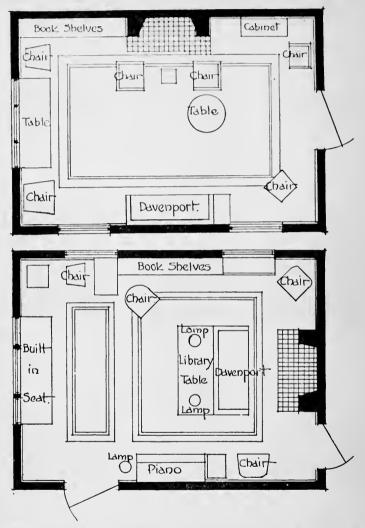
Top, a room showing the effect in furnishing of one large rug, a fireplace in the center of one long inside wall, and the other furnishings well related to these. Bottom, a room showing a good arrangement of two rugs; a fireplace in the short inside wall, and the furniture well arranged in occupational centers.
